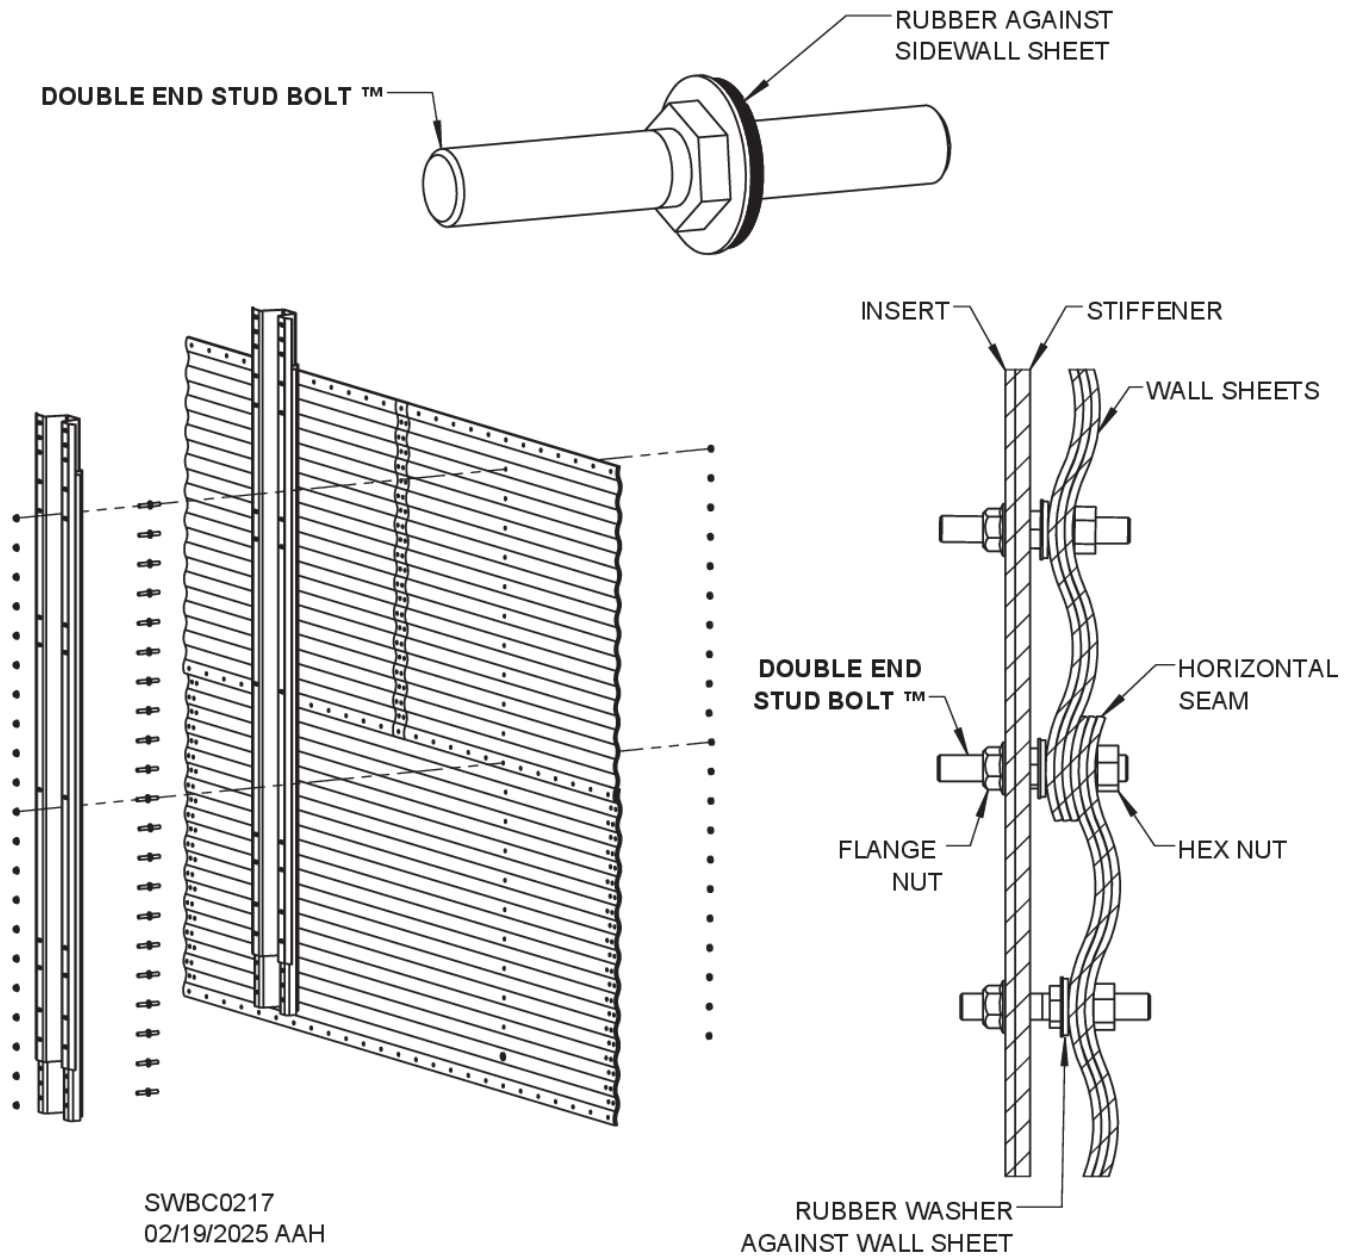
Attaching stiffener to laminated sidewall sheets (Triple-laminated sheets shown)
